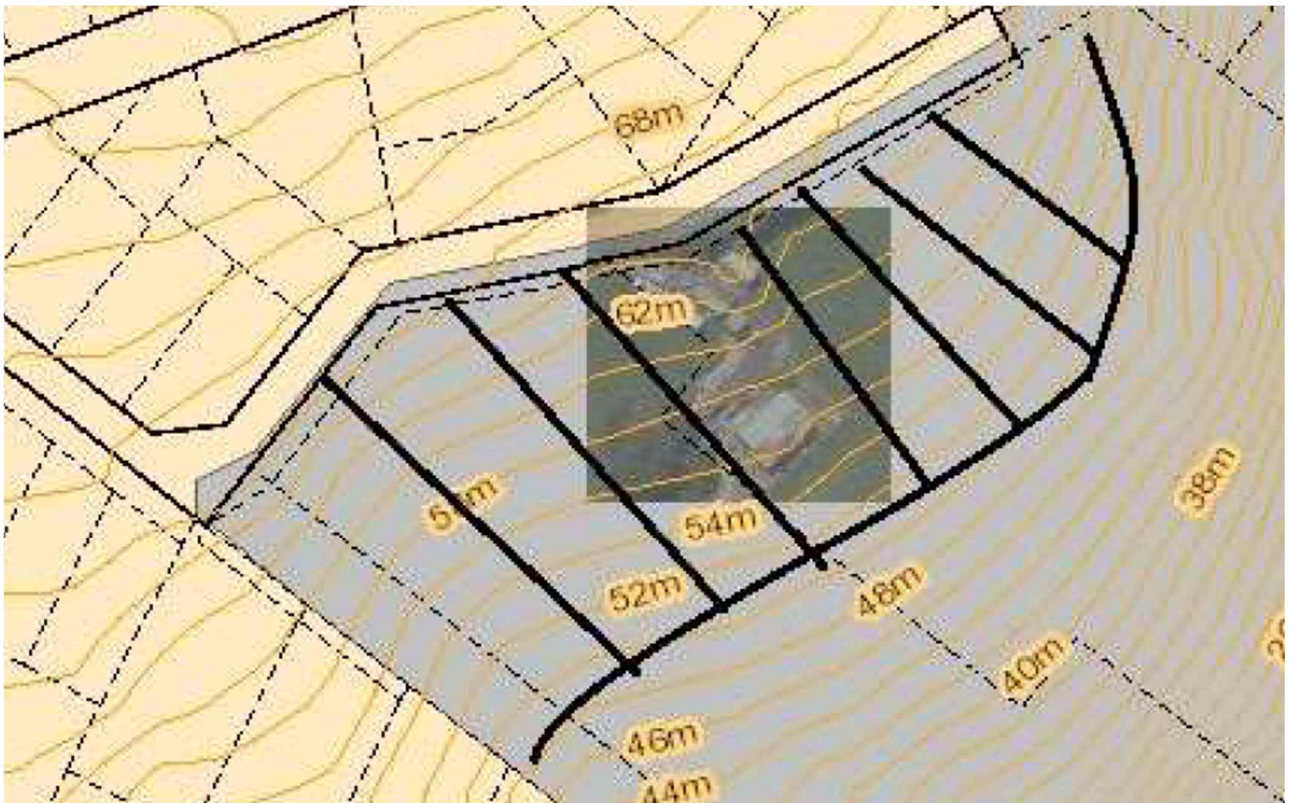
Potential lot layout of upper part of site adjoining Gloucester St.
